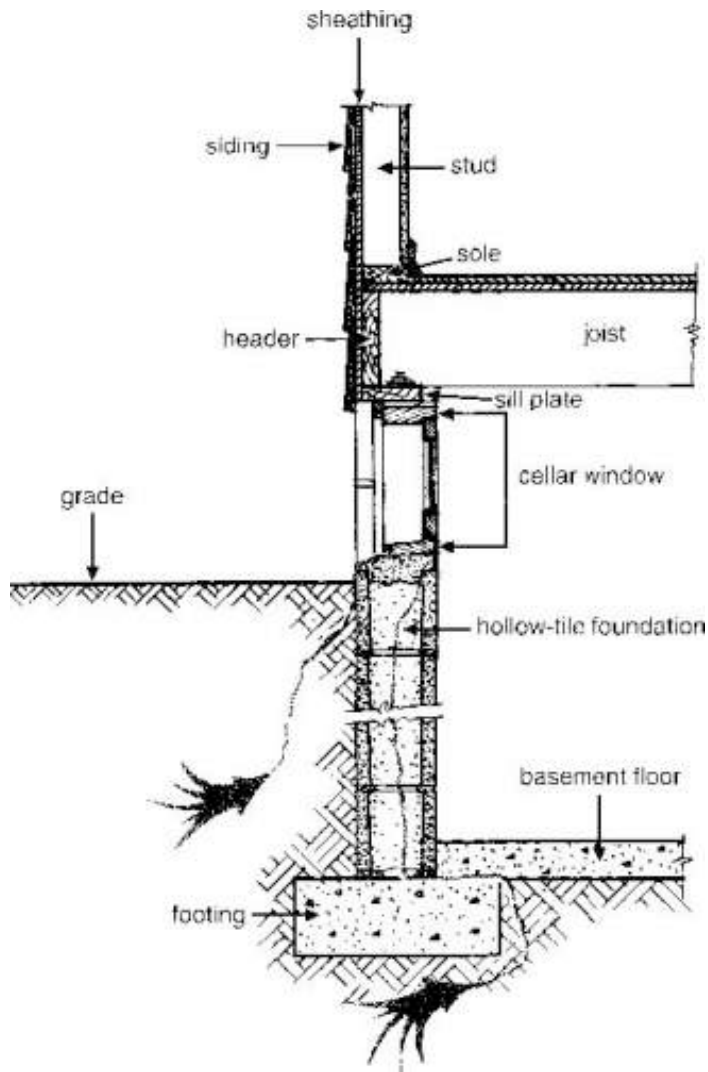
This is an example of a concrete block foundation with basement window. Avenues of termite access are indicated by the heavy arrows in the soil (NPMA).
